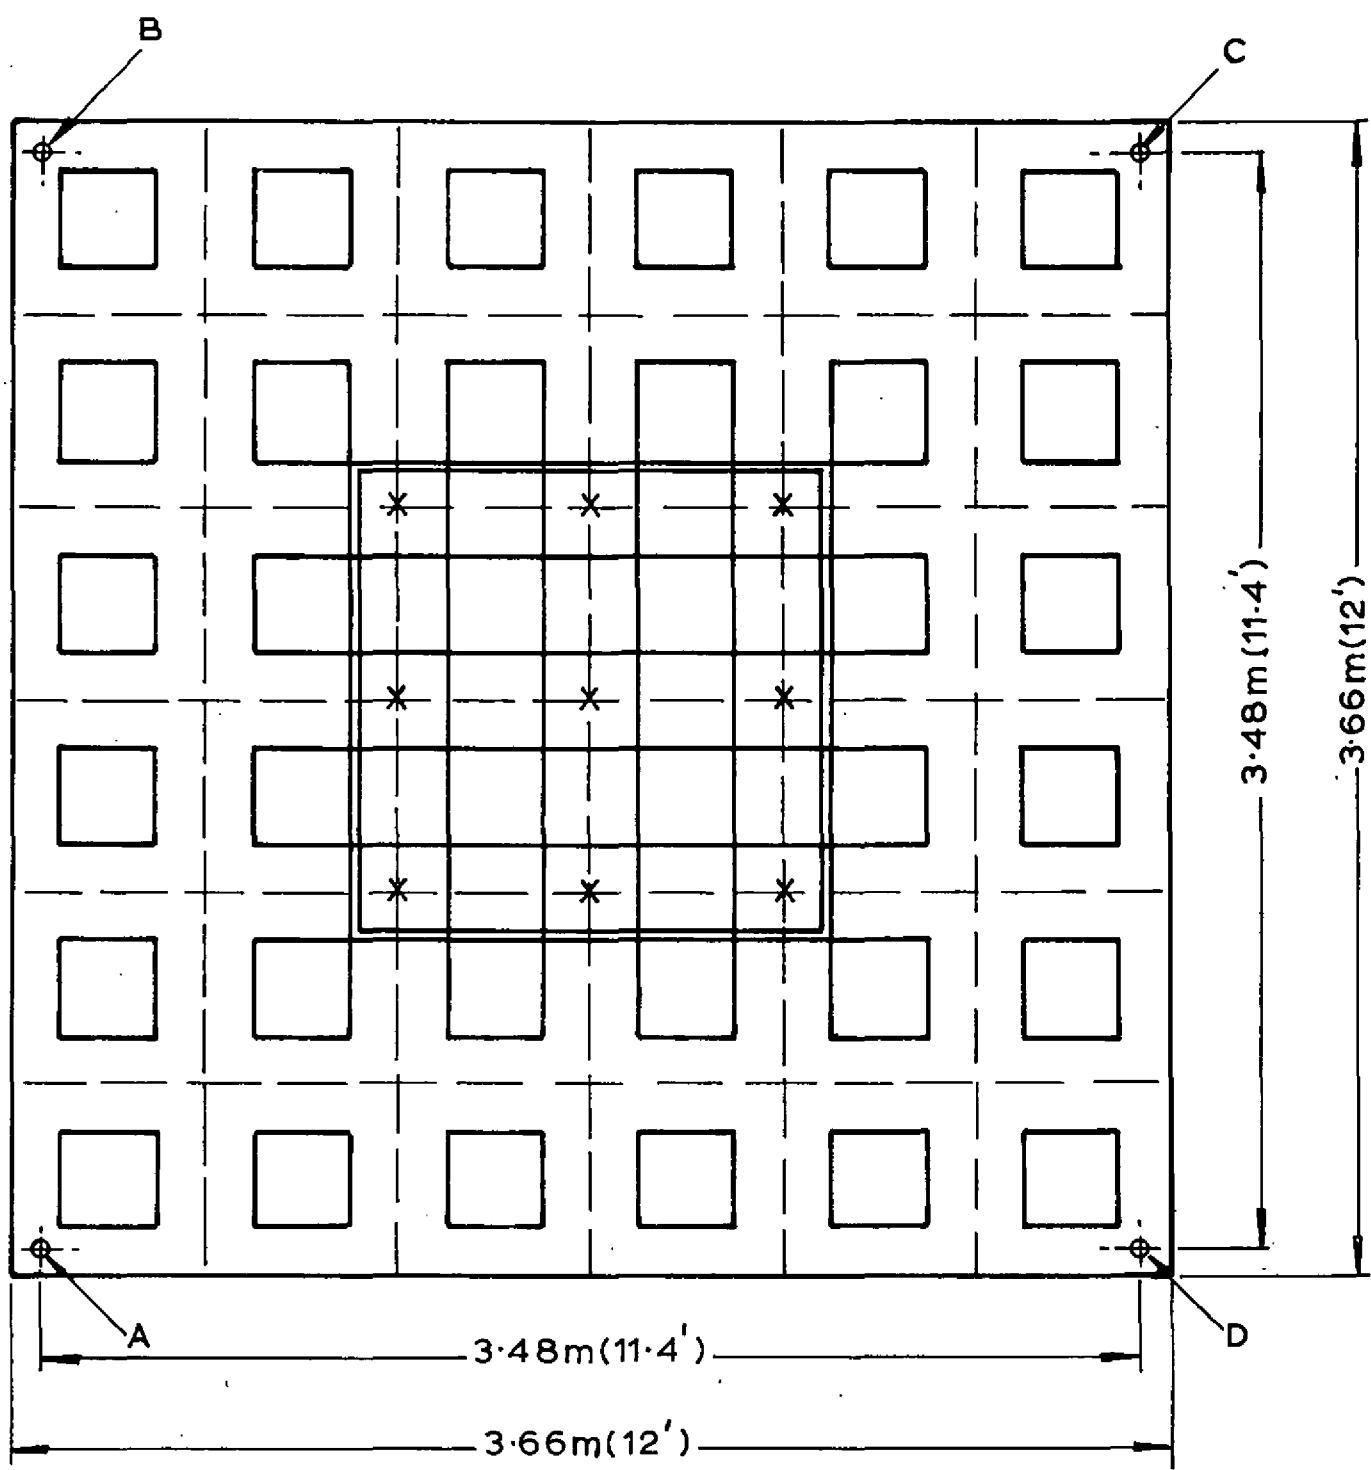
ARRANGEMENT OF SPRINKLER PIPEWORK
